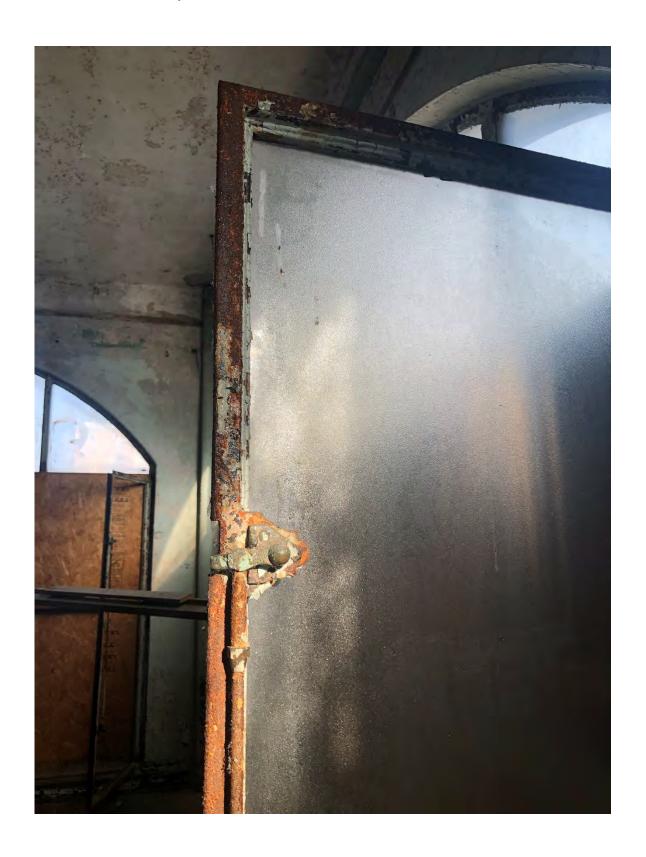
Interior, 2<sup>nd</sup> Floor Window Detail. 2/4/19
